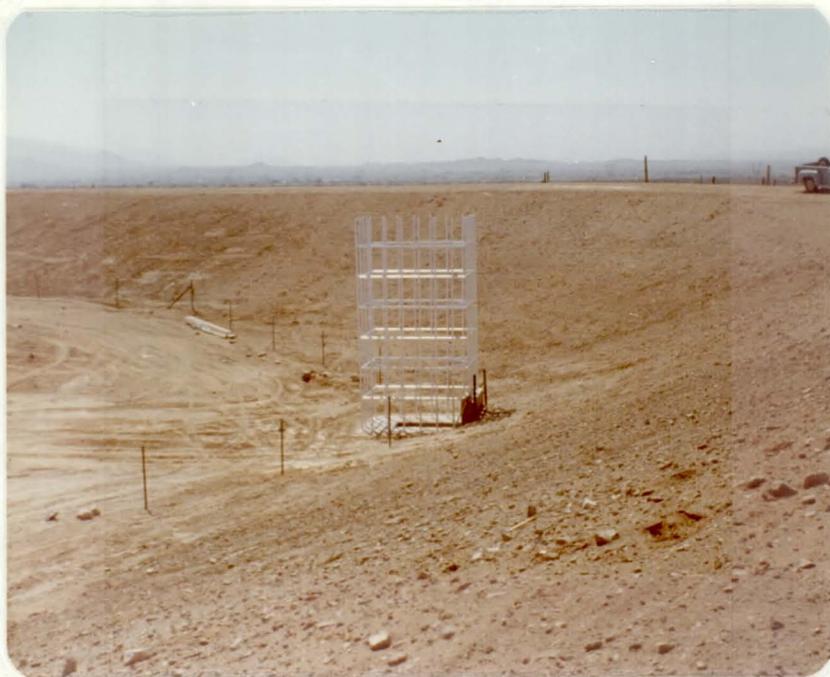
(April 25, 1975) - Trash rack over principal spillway intake structure.
